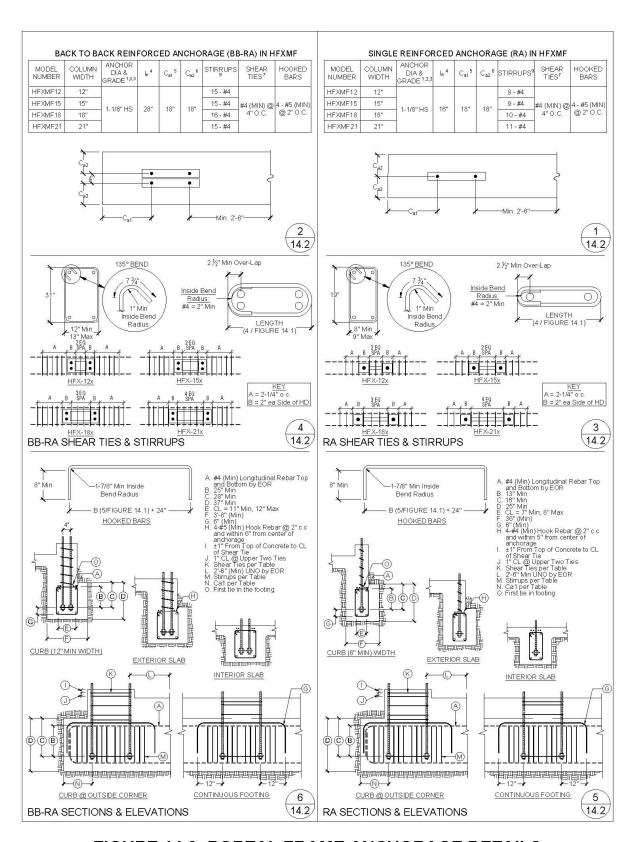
PORTAL FRAME ANCHORAGE DETAILS
